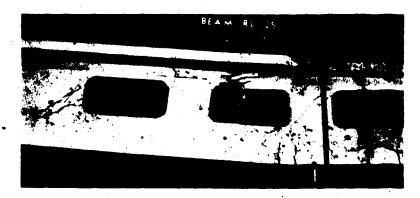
CRACKING AND FAILURE PATTERN OF BEAM 24-16-6
